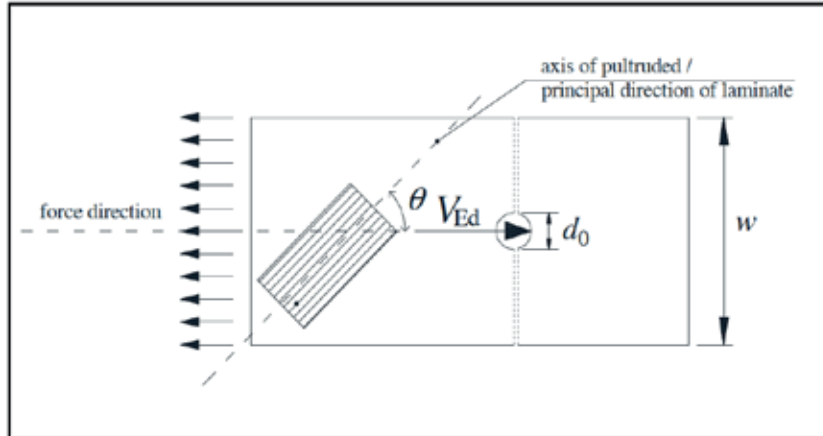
Net tension failure mode illustrated with a single bolt.
